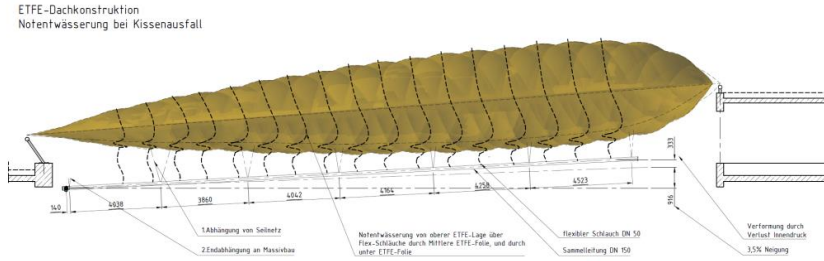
longitudinal section with collapse dewatering pipes (formTL)
